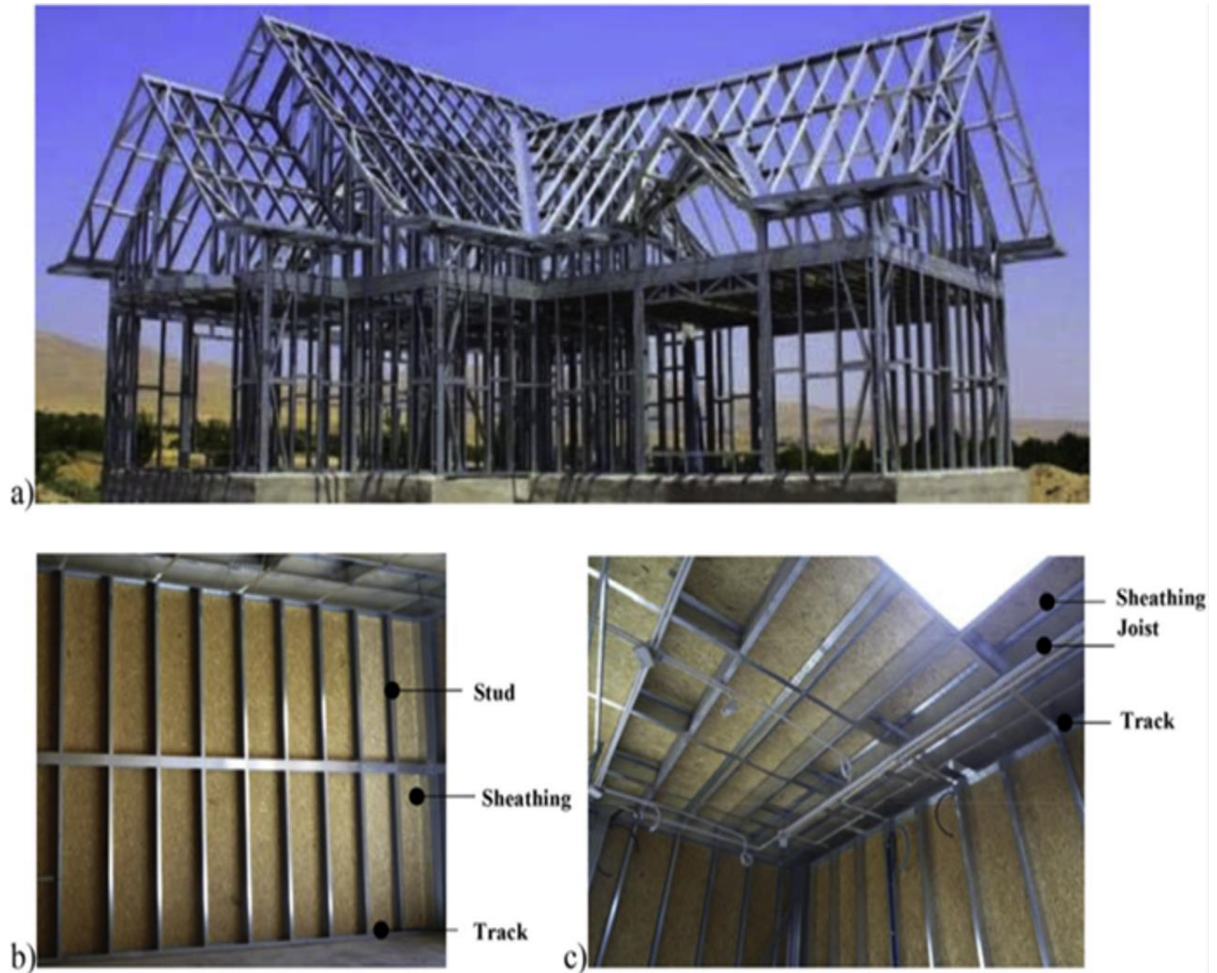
Typical application of lightweight steel elements in structural systems. a) Typical lightweight steel construction; b) Wall framing; c) Floor framing.
